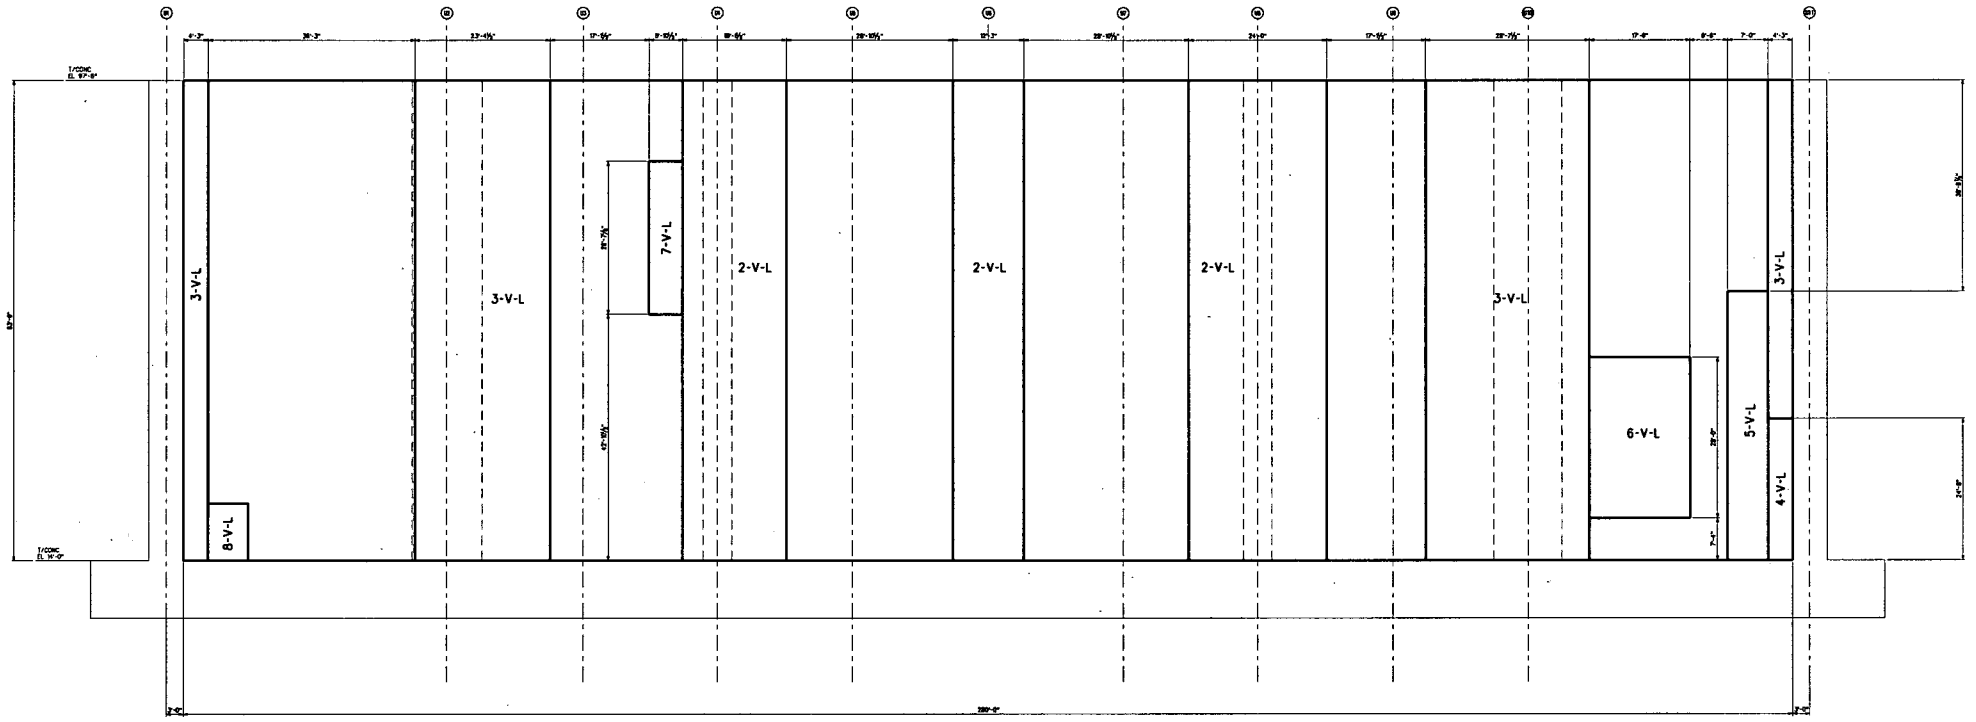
BASIN NORTH WALL LOOKING SOUTH
